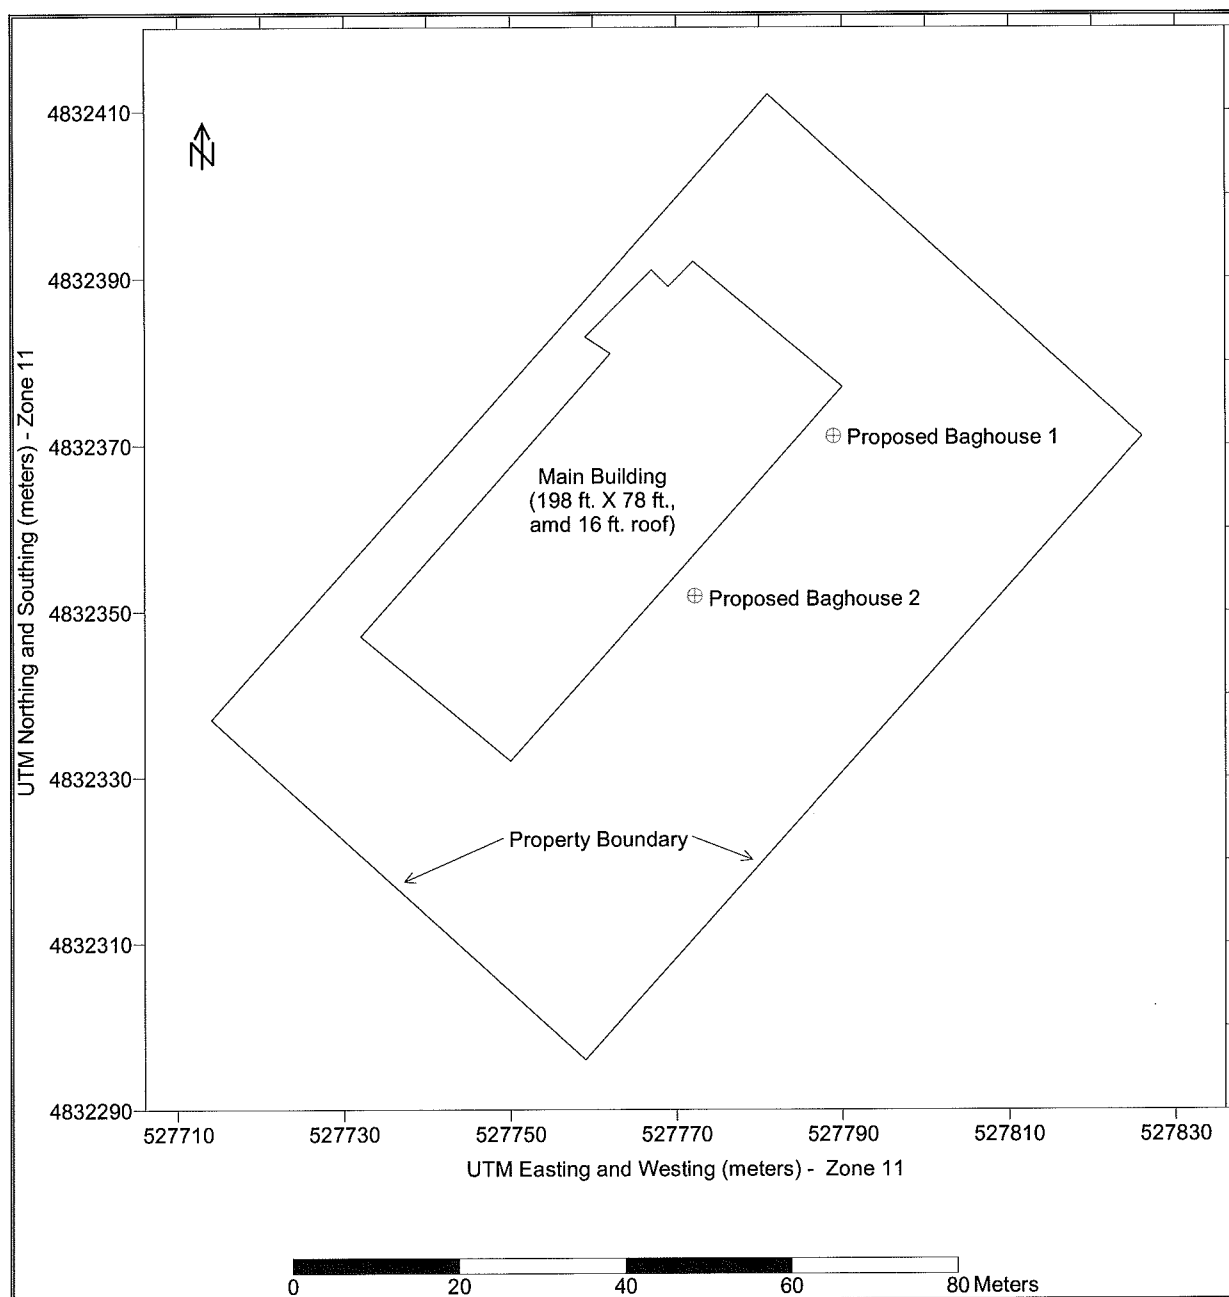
Eagle Silicon Caldwell Facility Site Plan
